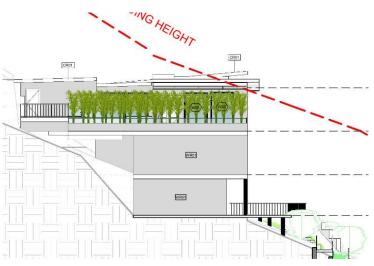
Extract of Architectural plans showing subject building element beyond the 8.5m maximum permissible building height
